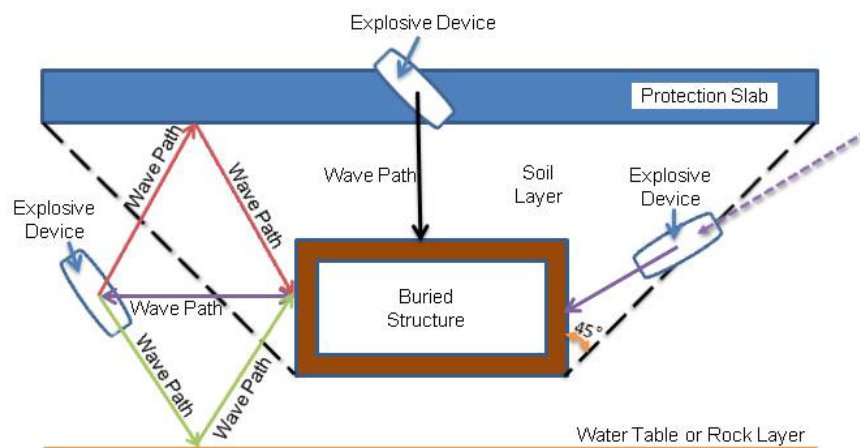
Engineered Site-Specific Barriers Above an Underground Structure
